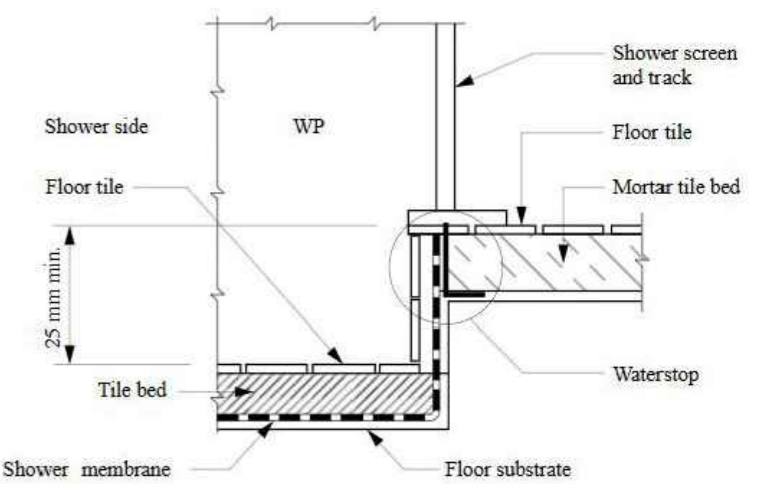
Typical enclosed stepped down shower construction (membrane above tile bed)
